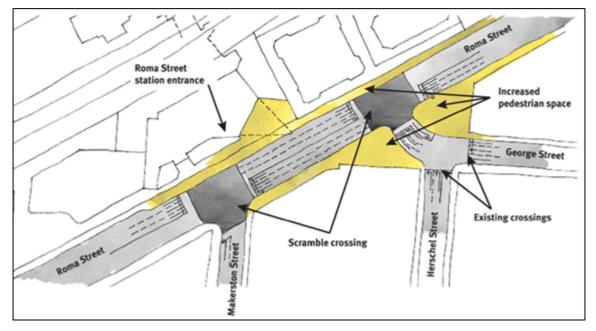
Roma Street Station – concept layout for pedestrian footpath treatments and crossing facilities
